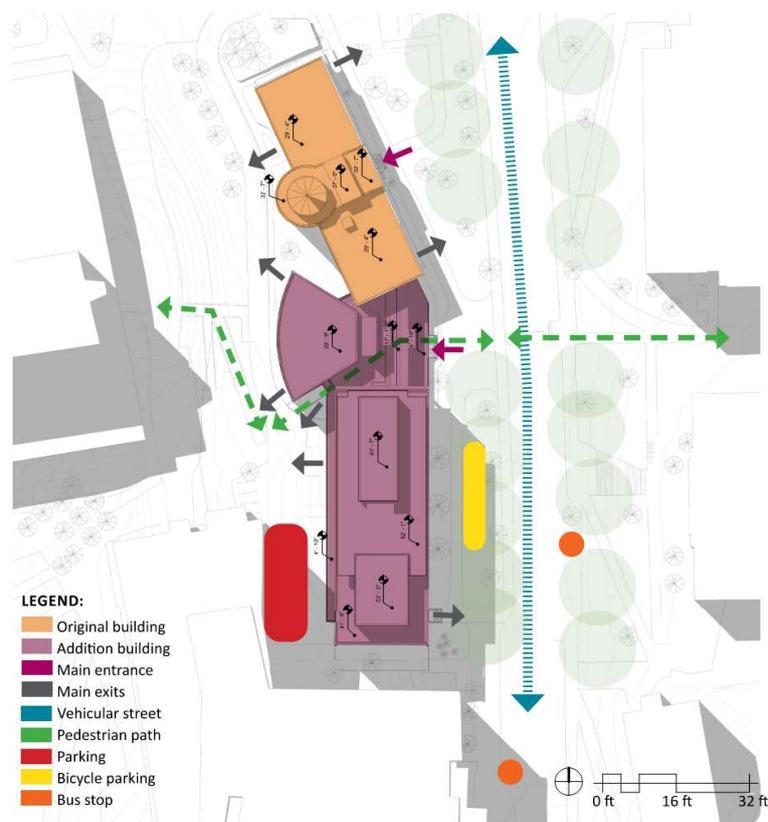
Site plan of the analyzed building (Source: Author [12]).
